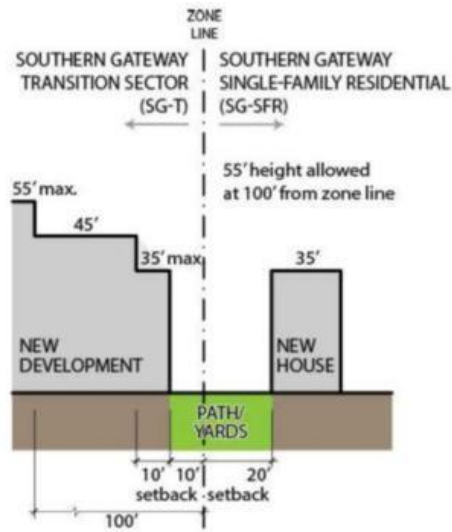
Maximum height of buildings near the southern gateway – single-family residential zone.
